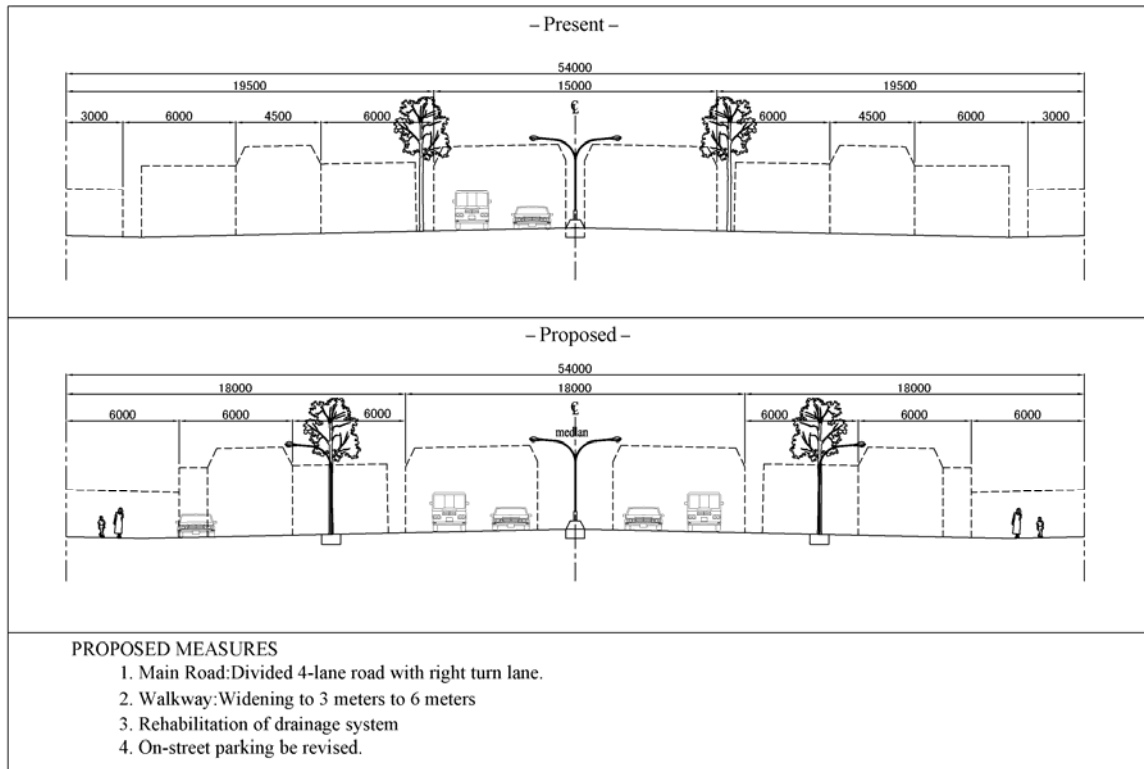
TYPICAL CROSS SECTION OF KENYATTA AVENUE
